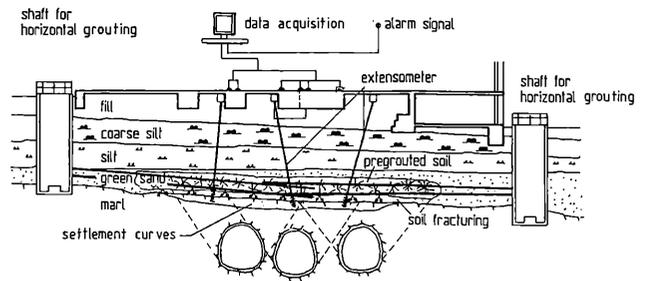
Metro Essen, undercrossing of an industrial building, measuring and grouting scheme, STADT ESSEN (1987)
